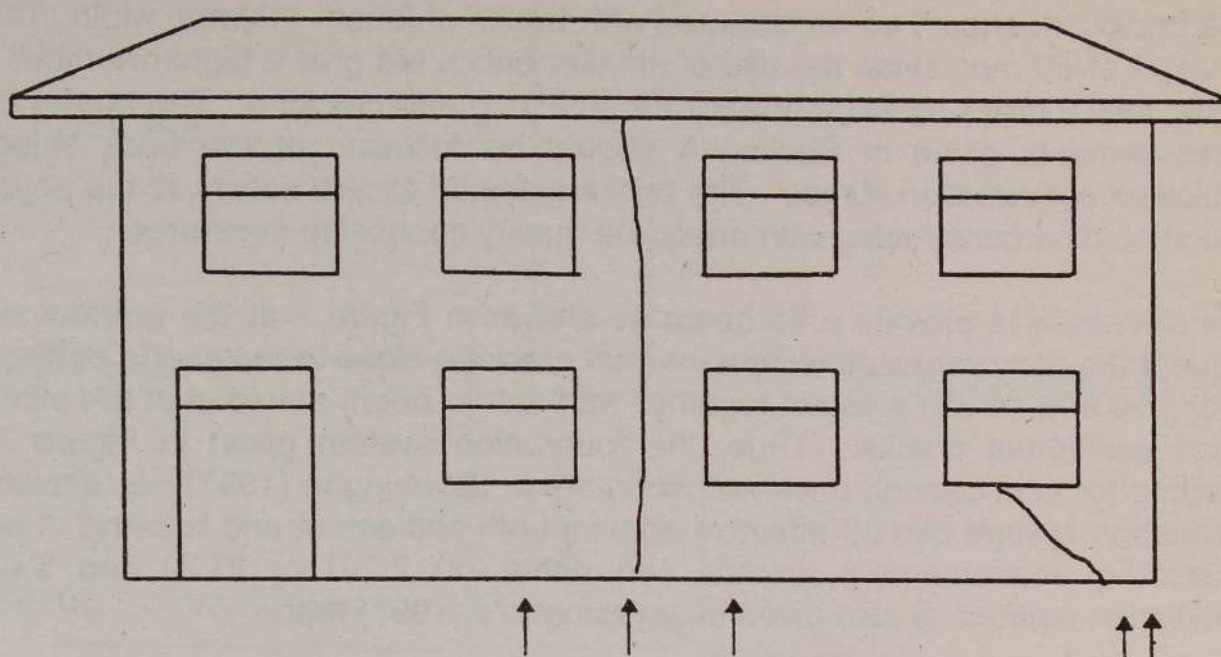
Swelling of clay under the centre and the edge of a building and the cracking due to it
